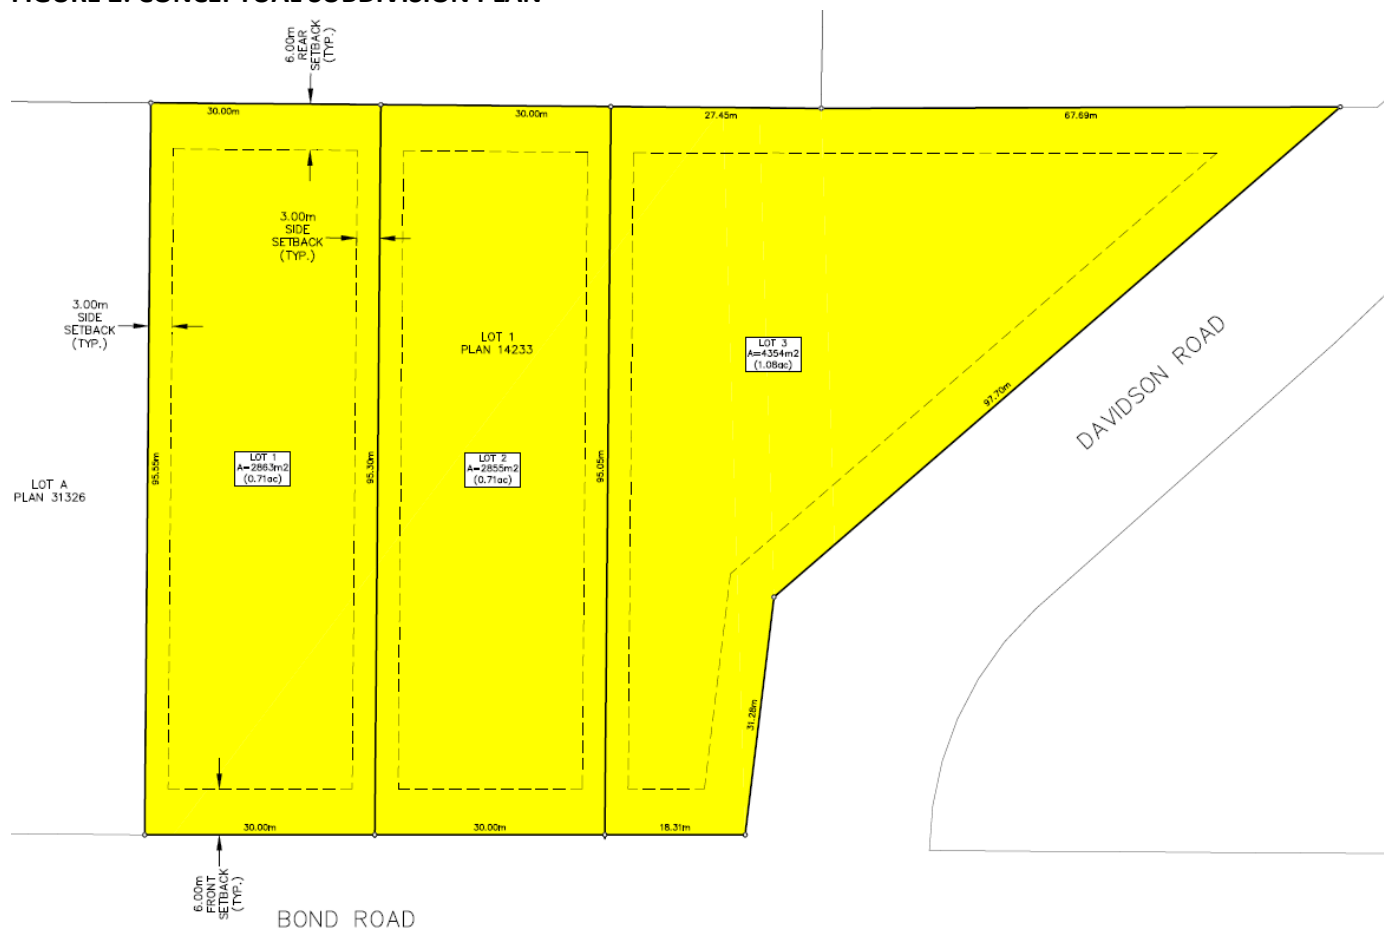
CONCEPTUAL SUBDIVISION PLAN
